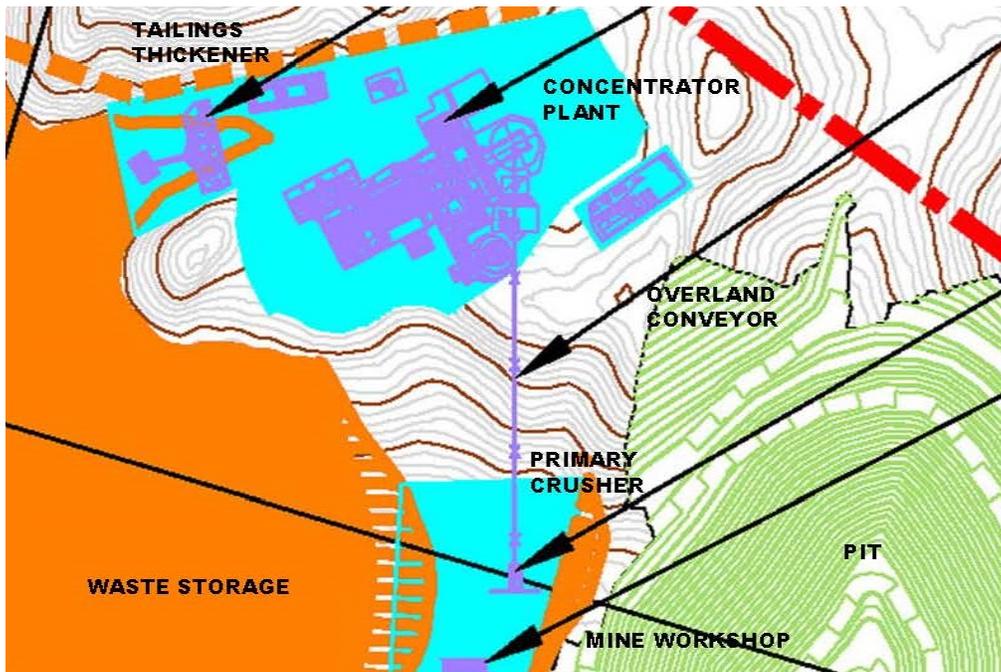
General Arrangement of Los Azules Processing Plant.
